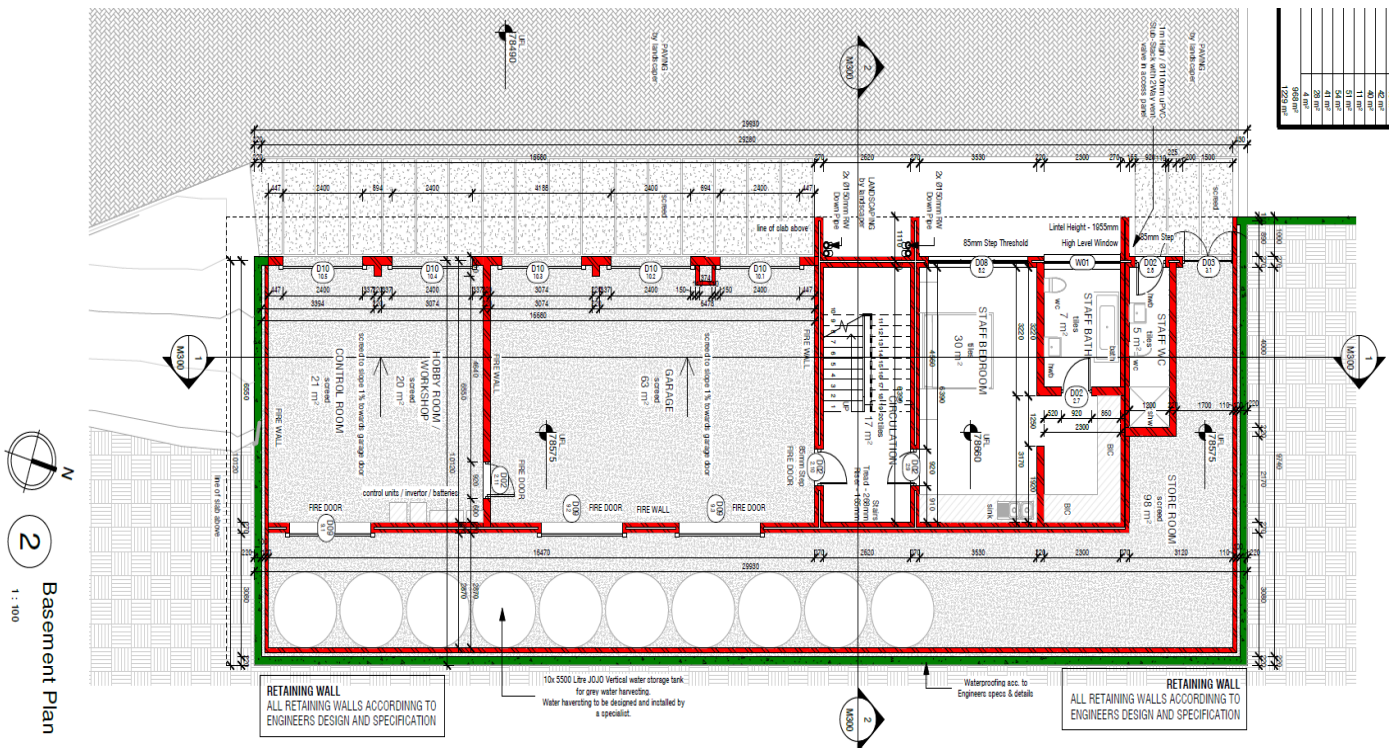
Basement Plan (Mathews + associate architects, 2023)
